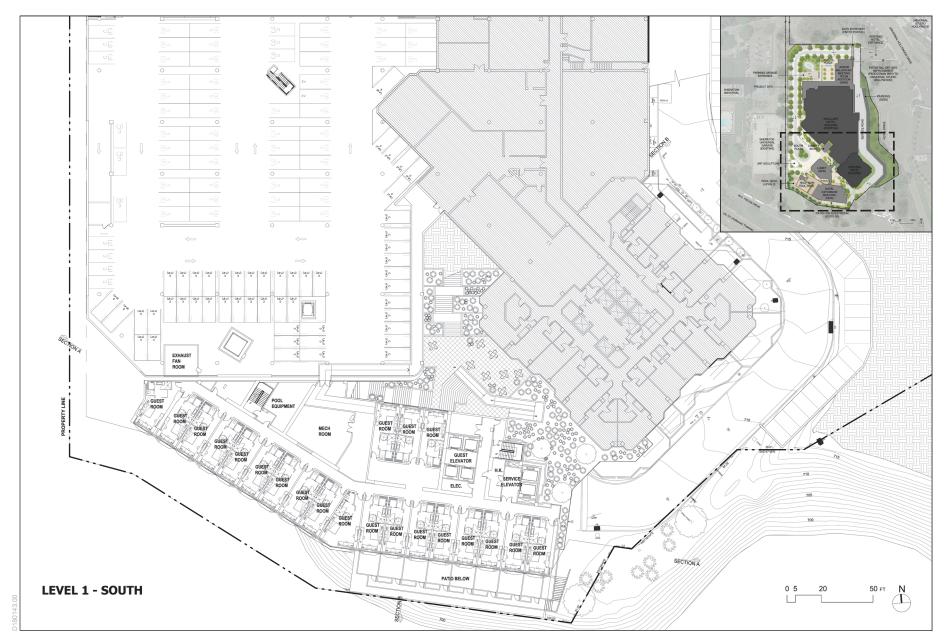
Level 1 (South) – Hotel Expansion Building
